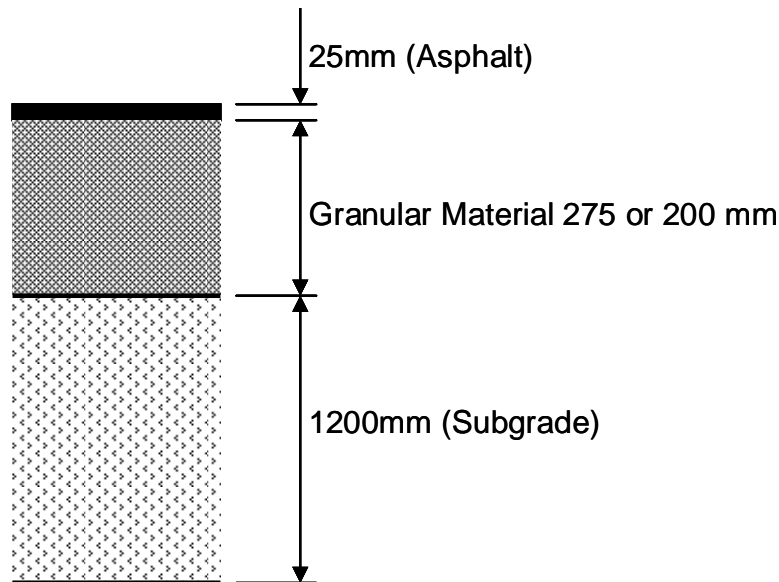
Pavement cross section for CAPTIF 1, 2, and 3 trials.
